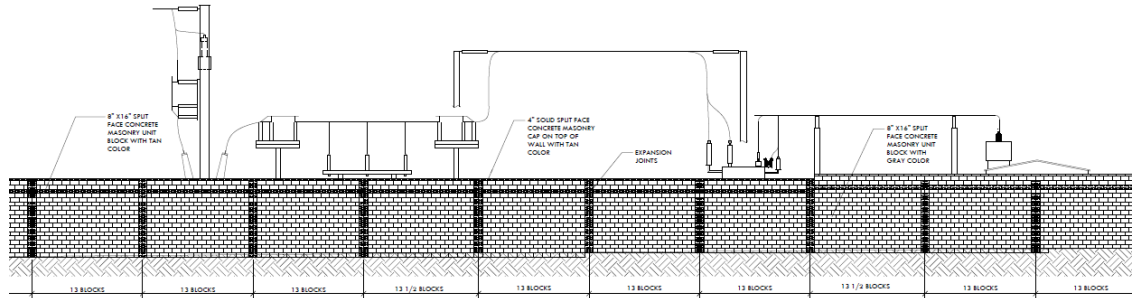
A: Walsh Substation view of concrete block wall with substation beyond.
